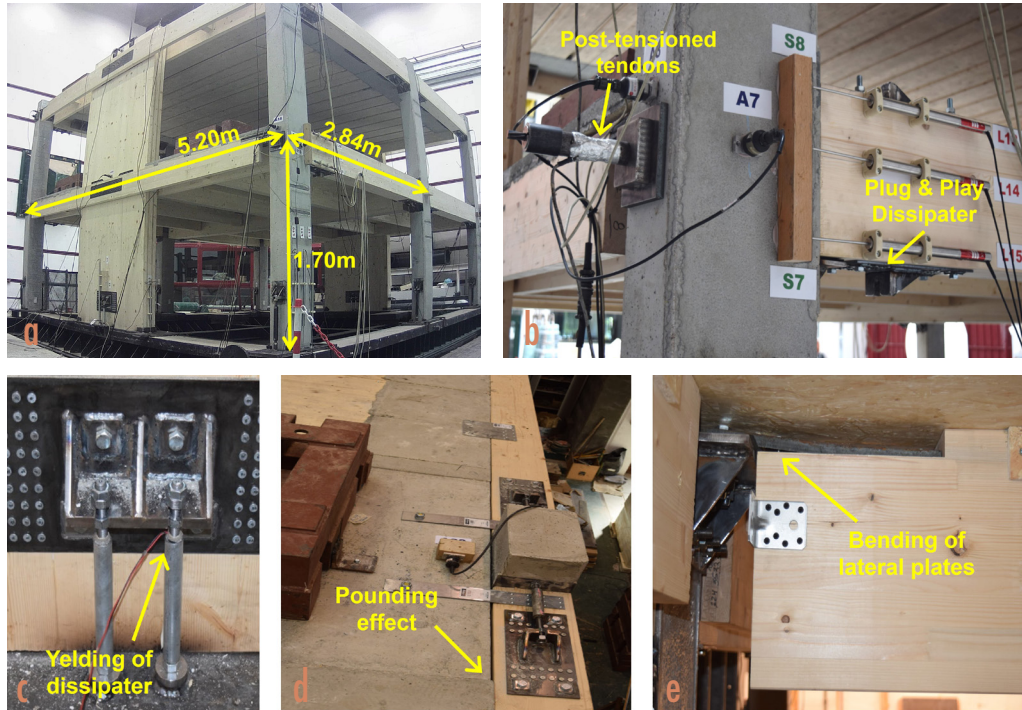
(a) Specimen configuration (Skeleton Building); (b) Connection details, including monitoring system, of a beam-column joint; (c-e) observed damage to the main load-bearing structure.
